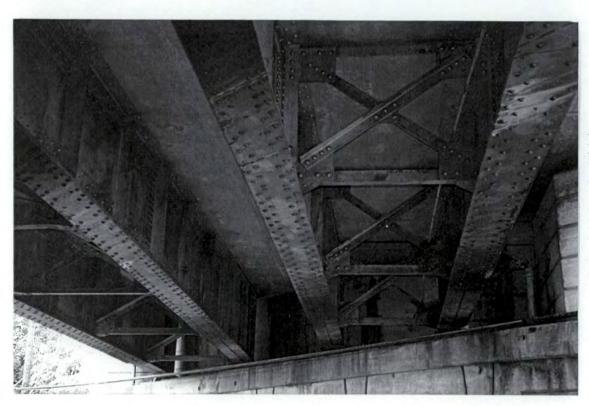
Highland Avenue Southern Railway Bridge – plate girders and cross frames looking west
